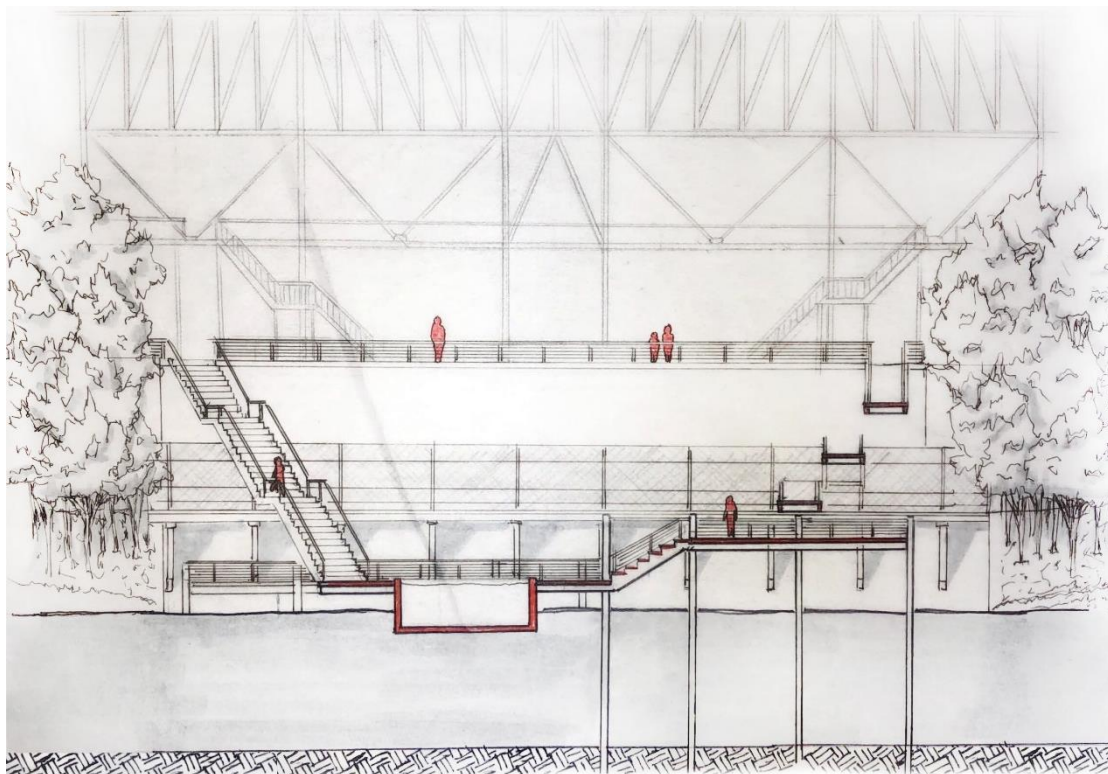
East Section through Public Pier and Floating Pool (source: Author)
